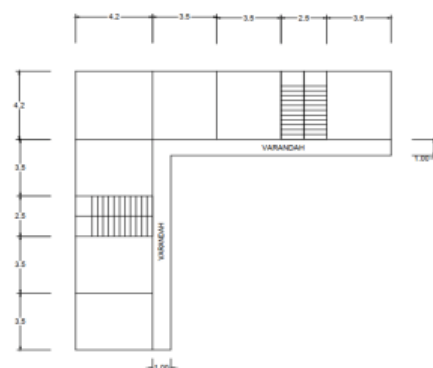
, Plan of RCC Re-entrant corner irregular Structure
